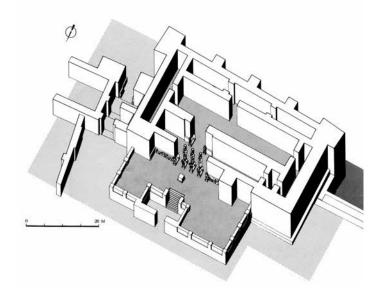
Isometric reconstruction of the Western Palace, Tell Halaf
